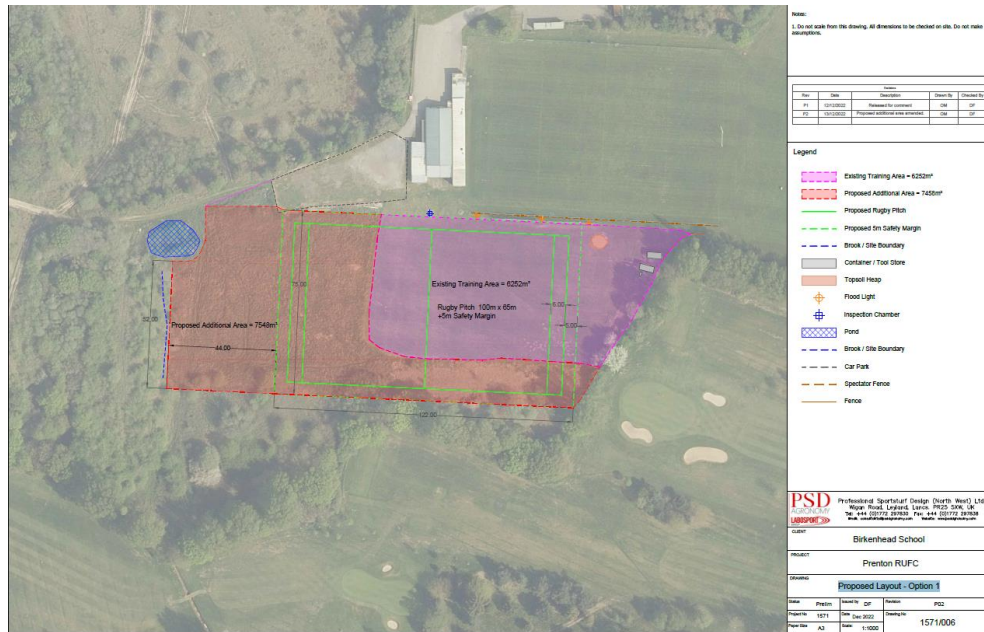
Proposed Layout - Option 1 (ref: 1571/006 Rev P02)
